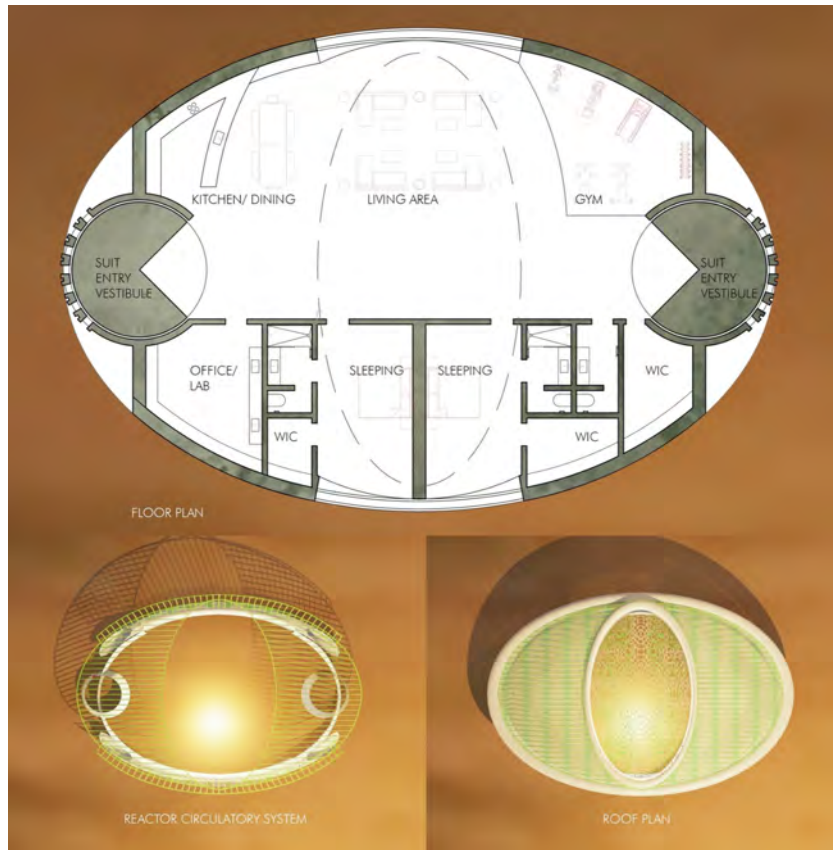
Floorplan, roof plan, and reactor circulatory system plan. (to left)
